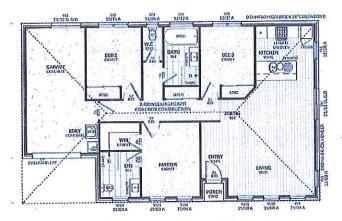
Proposed floor plan with roof shown dotted, as per application.
